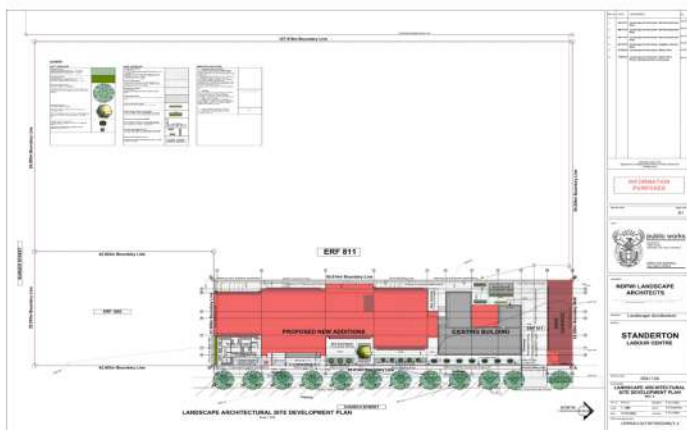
Landscape Architectural Site Development Plan, for Sketch plan (work stage 3) approval.
